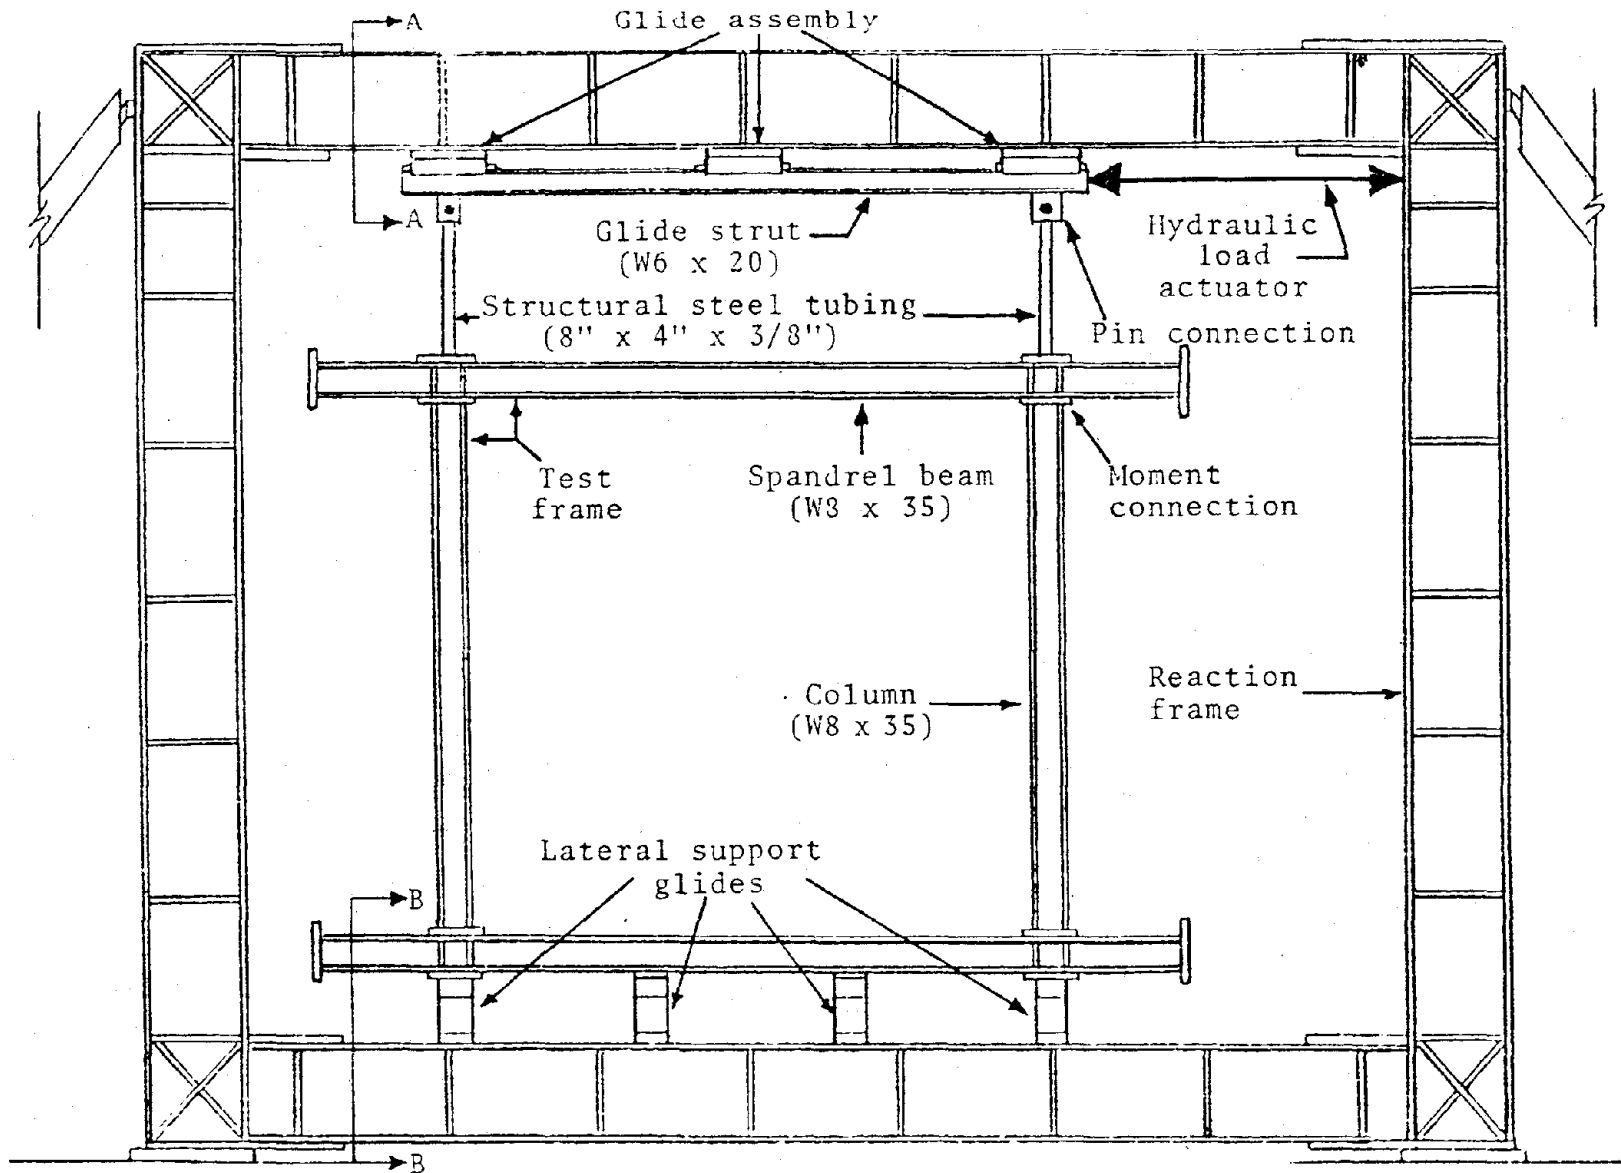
Test facility representing steel framing in one bay of a high rise building
